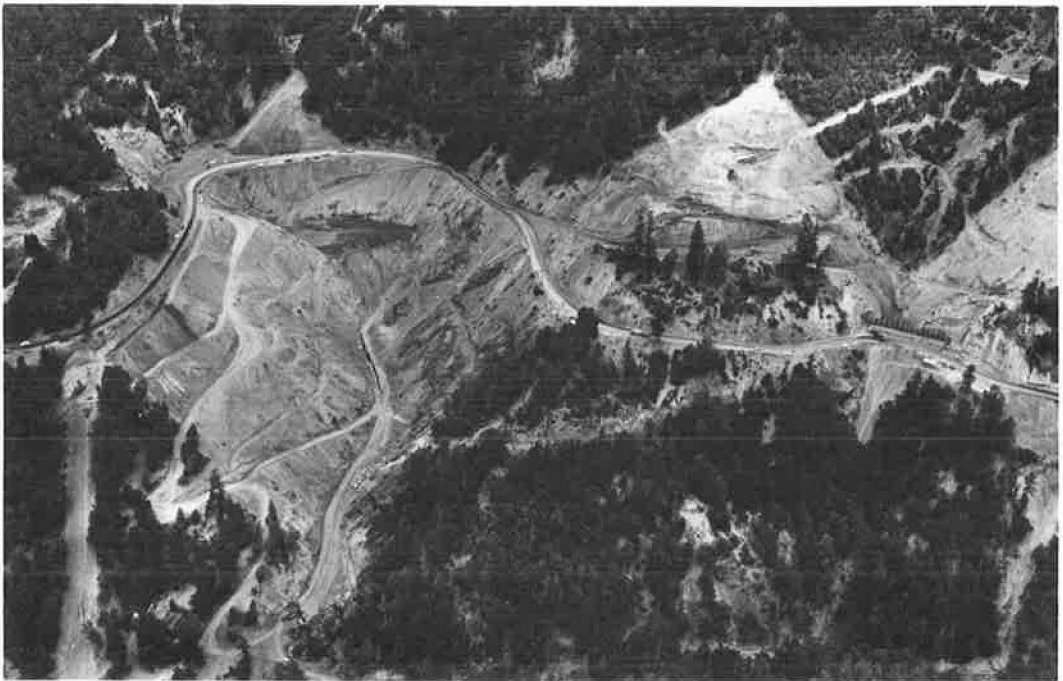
Aerial view after clearing and grubbing and stabilization trench construction at Squaw Creek.
